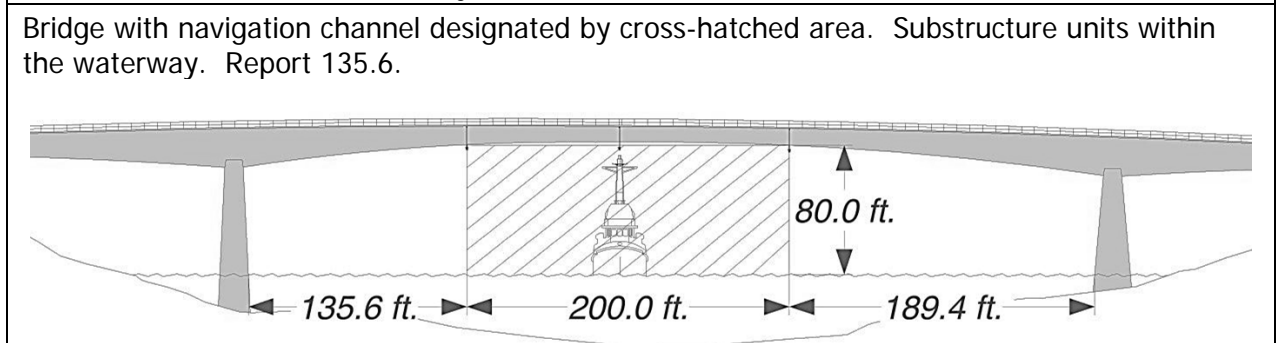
Bridge elevation view indicating navigation channel clearances to substructure units in the waterway.
